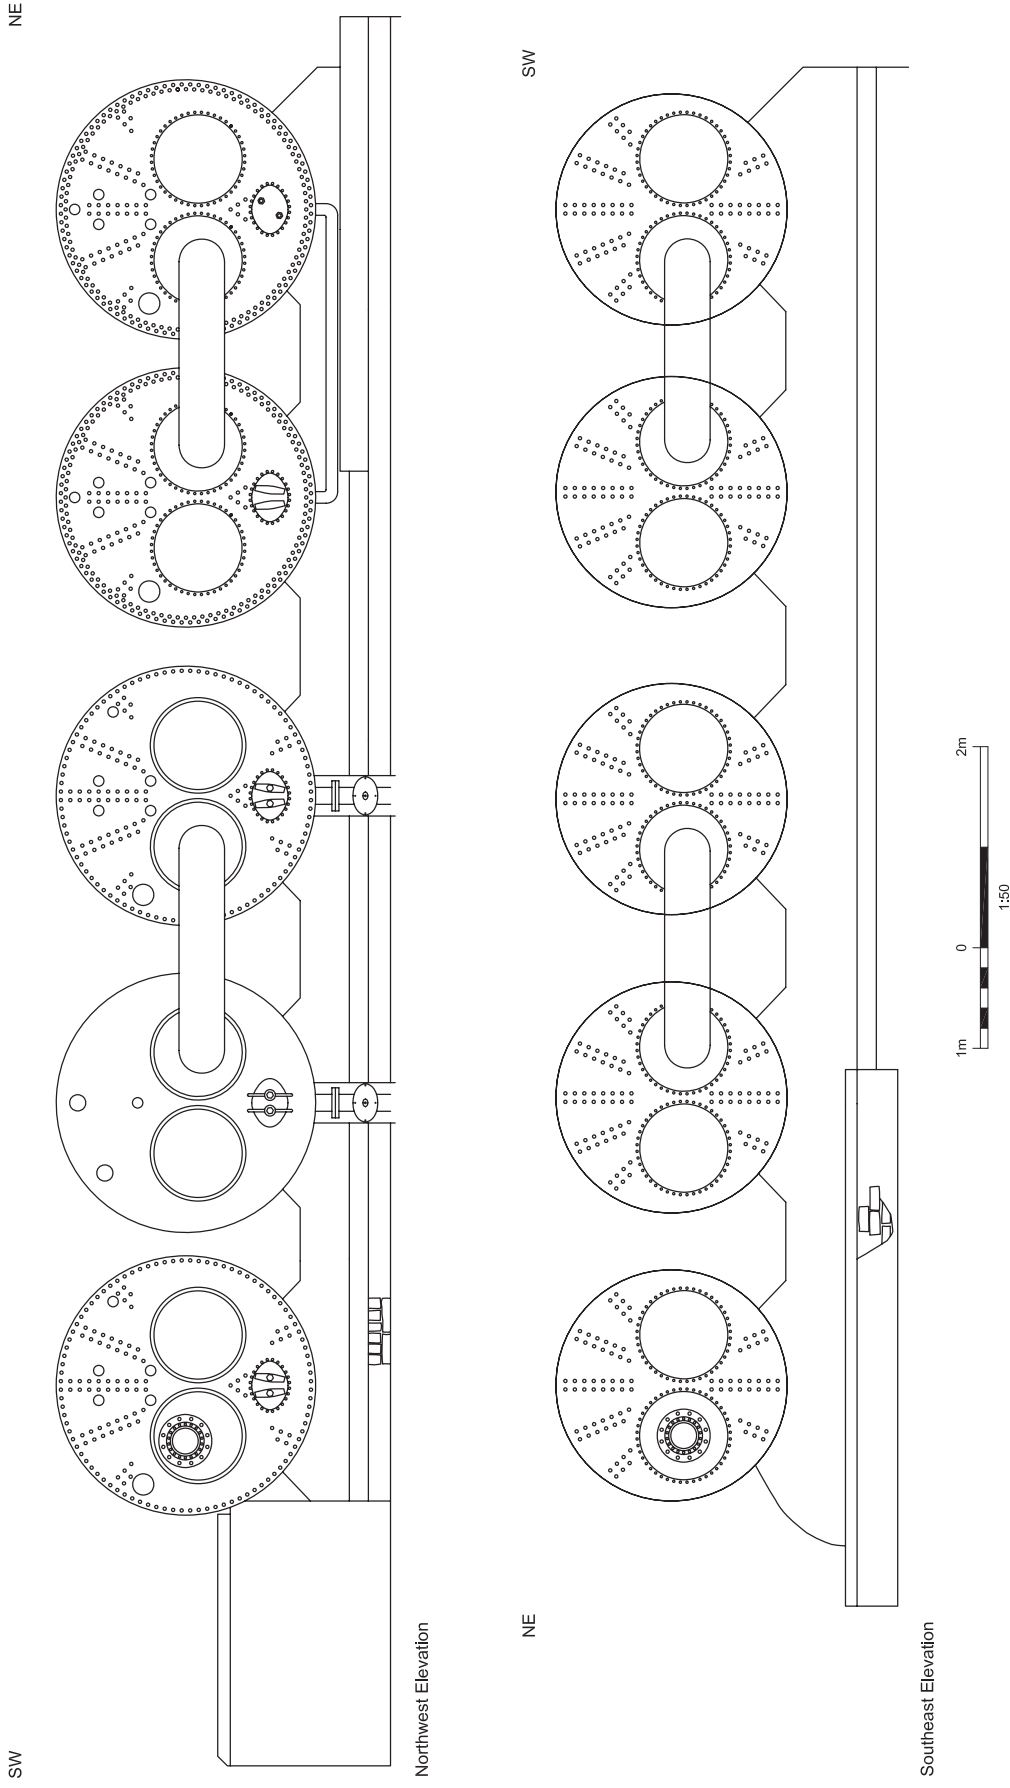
Northwest and Southeast Elevation of the Contact Tanks
